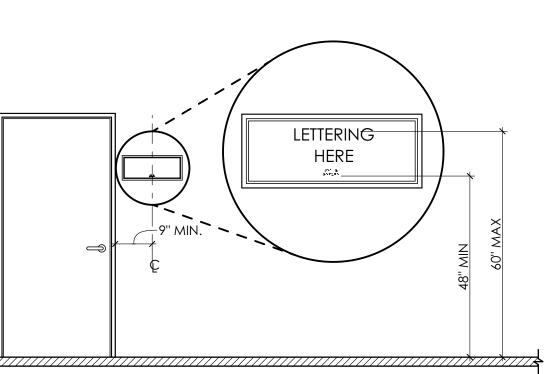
HEIGHT OF RAISED CHARACTERS ABOVE FLOOR SEE FIGURE 703.4.5 FOR BRAILLE REQUIREMENTS
